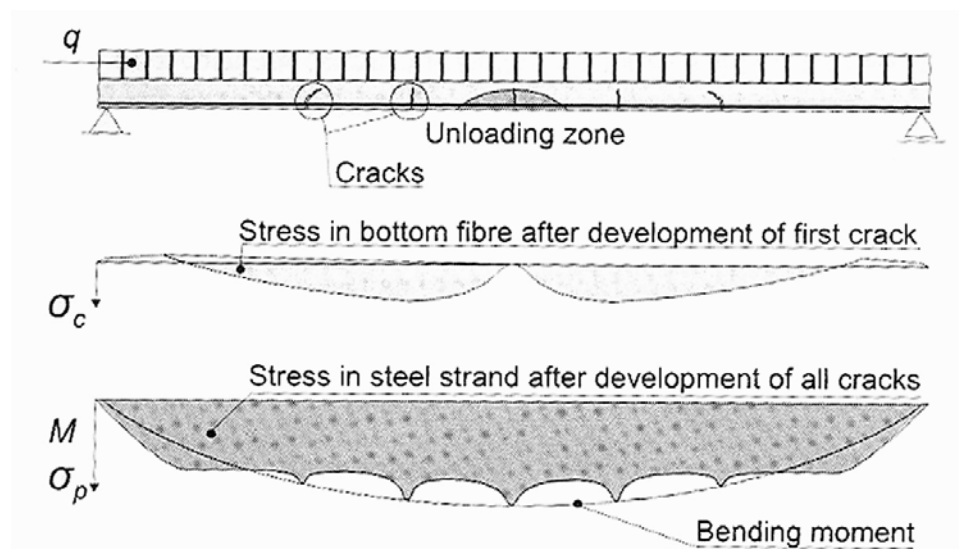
Development of flexural cracks and shear cracks and axial stress in bottom fibre of the concrete cross section and in the steel strands [Fellingner 2004]
